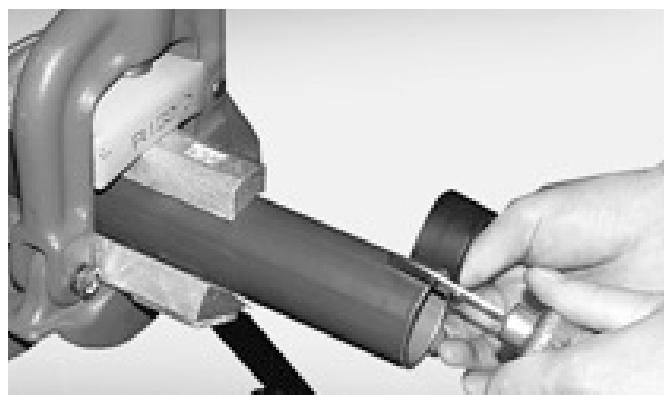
Before threading PVC-coated conduit, make a series of cuts along the axis of the conduit to break-up threading chip.
